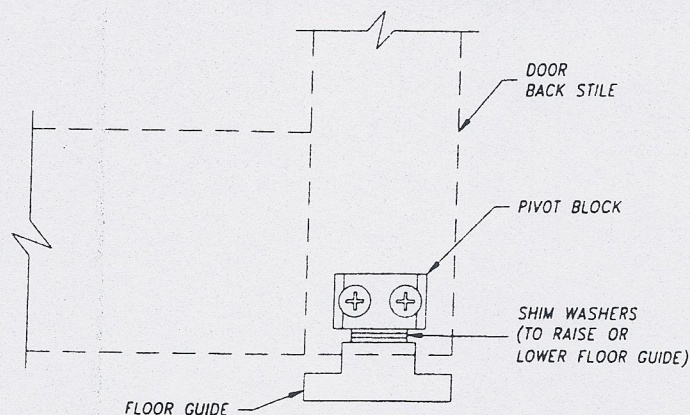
Installation of Door (SX) Bottom Pivot Assembly
